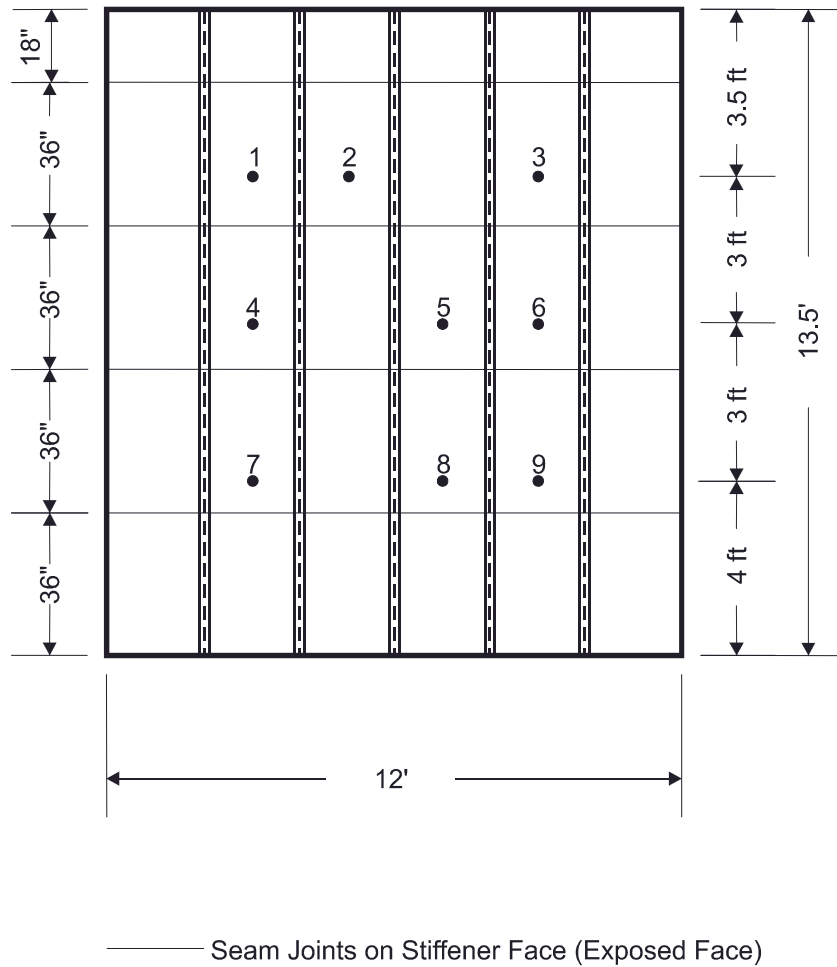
Deck assembly (reflected ceiling plan, stiffener face).
